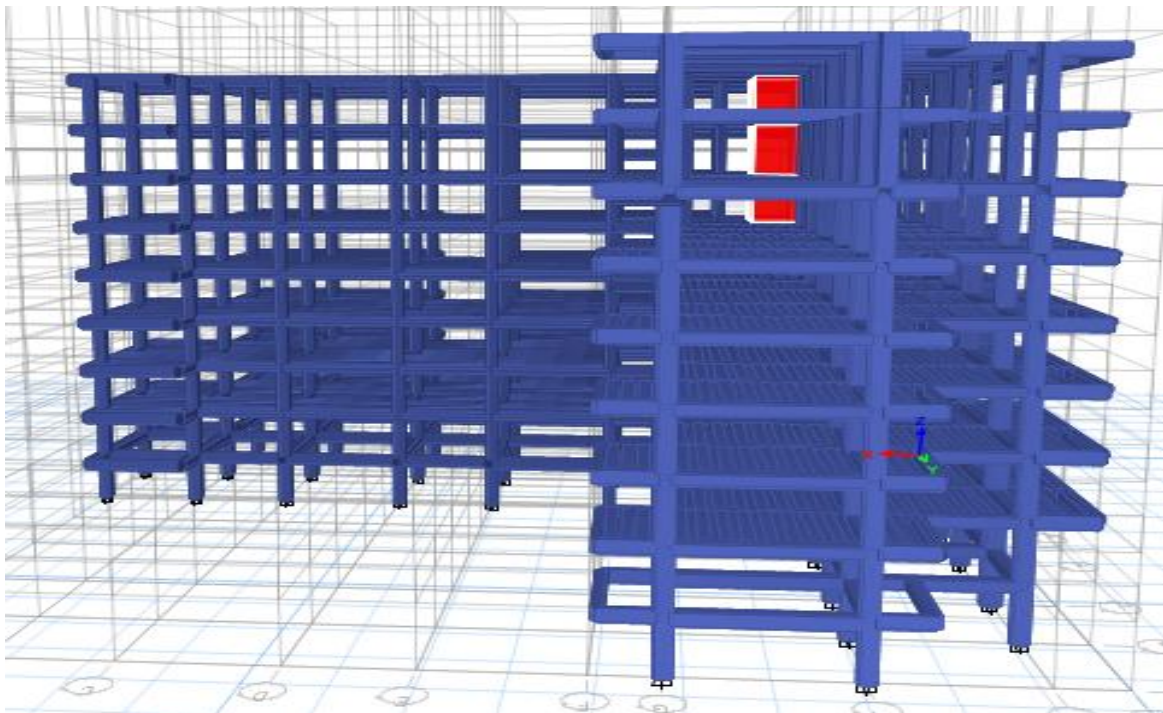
Three dimensional Eight Storey Nonlinear or RC L-Shaped Building with shear wall
